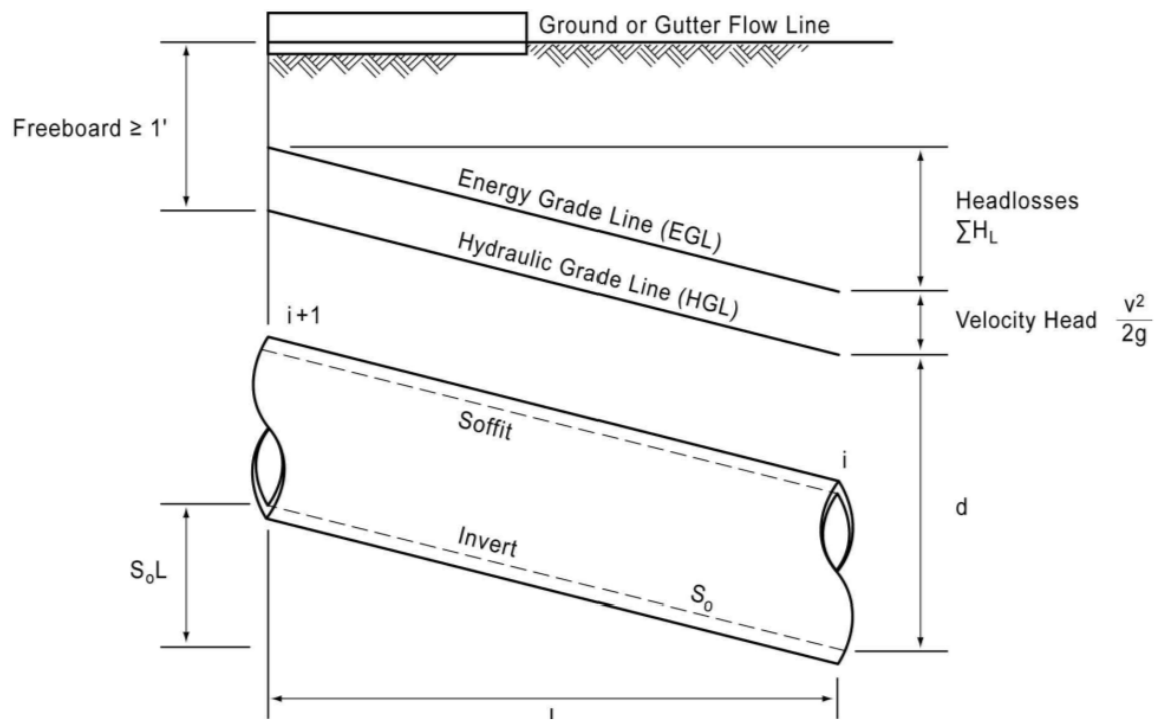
Definition Sketch for Storm Drain Hydraulic Calculations
